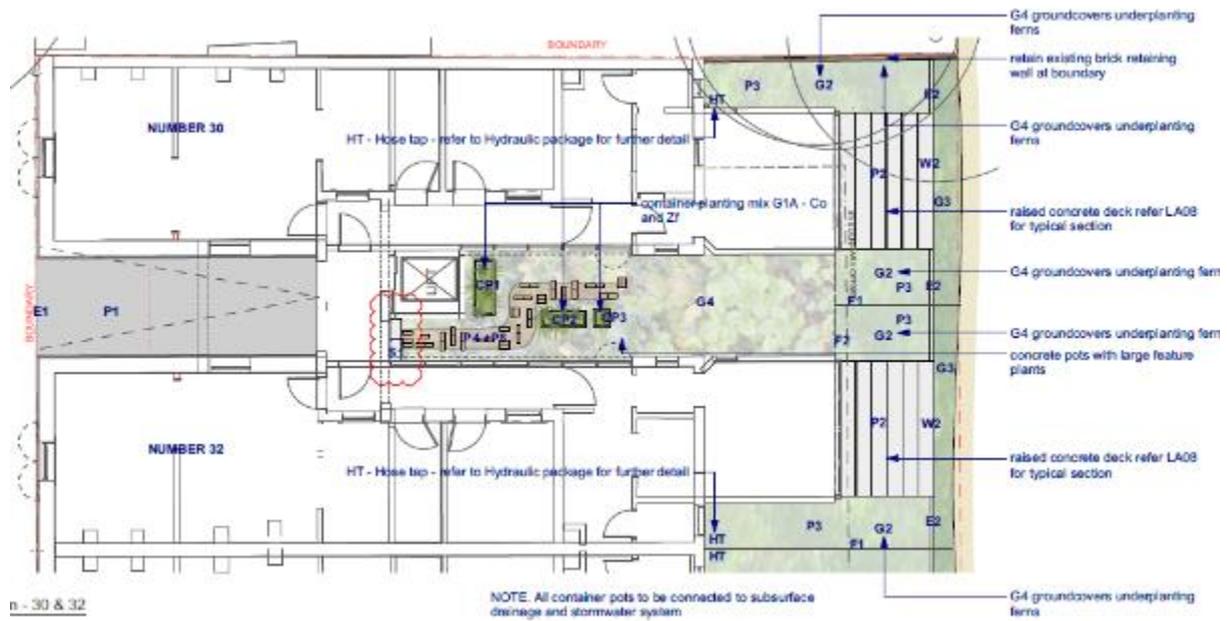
Typical landscape plan (for No.30 and No.32 Lower Fort Street)
